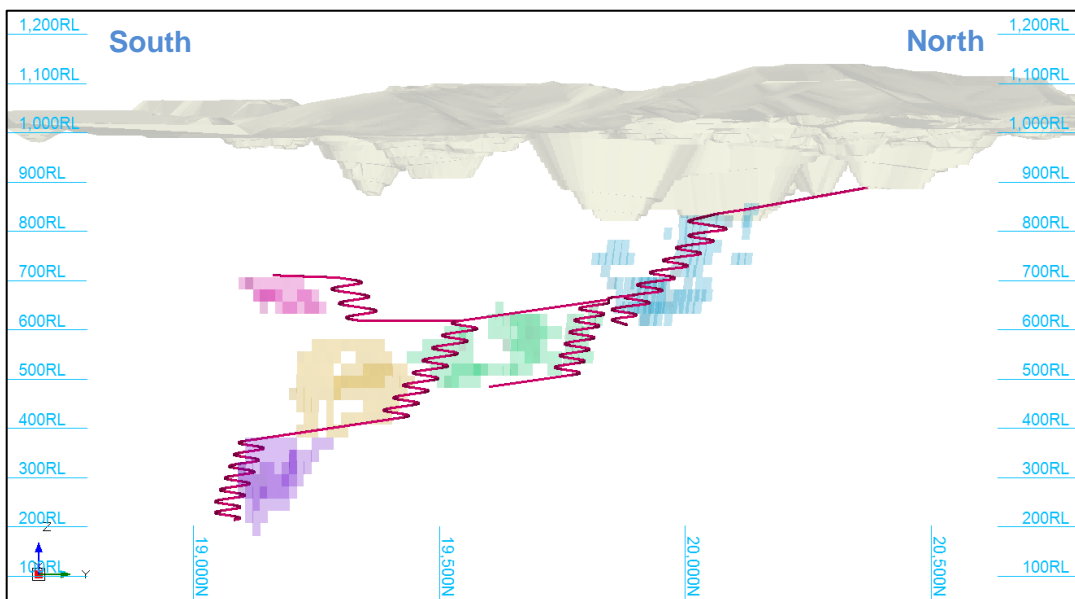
Long Section looking West of Wassa Decline Access Design
